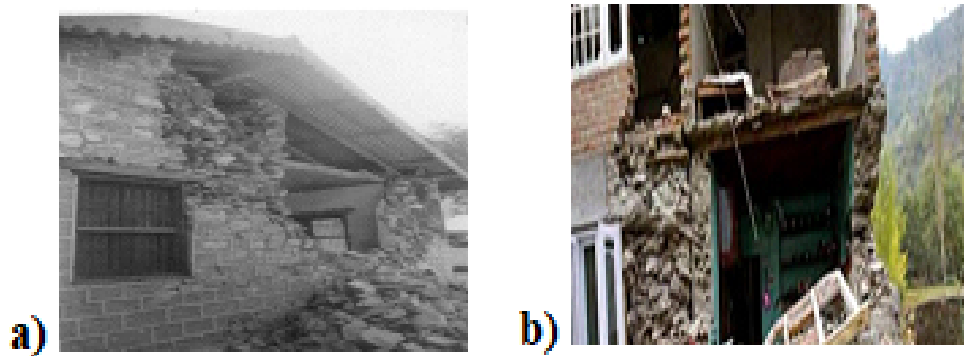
Junction failure during the Kashmir earthquake a) displaced masonry at t-junction, b) structural collapse at t-junction [3].
